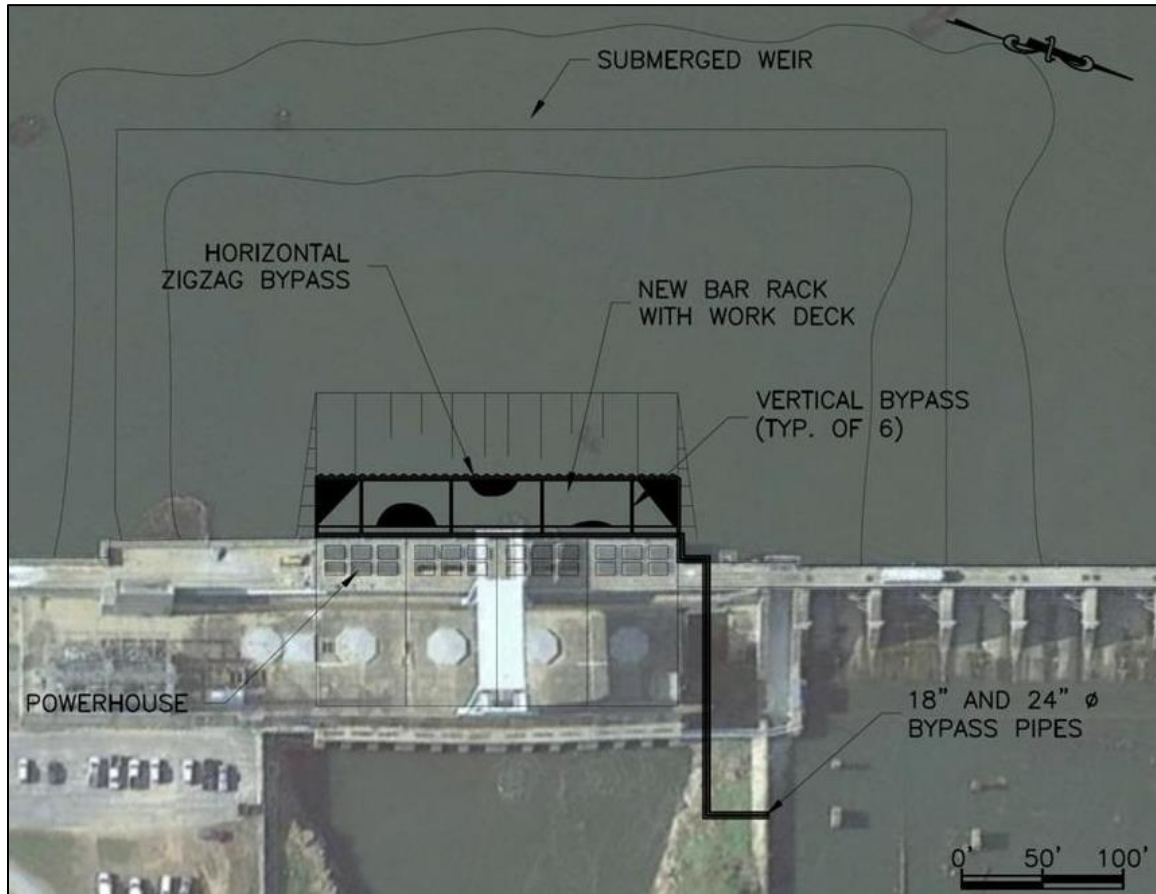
Vertical and Horizontal Zig-zag Bypass System- Plan View
